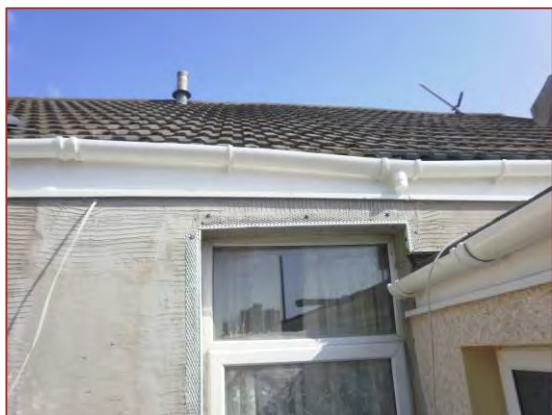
Retrofitted EWI detail at a gable wall and eaves junction
